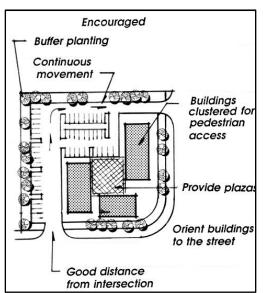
BUILDING PLACEMENT AT STREET
